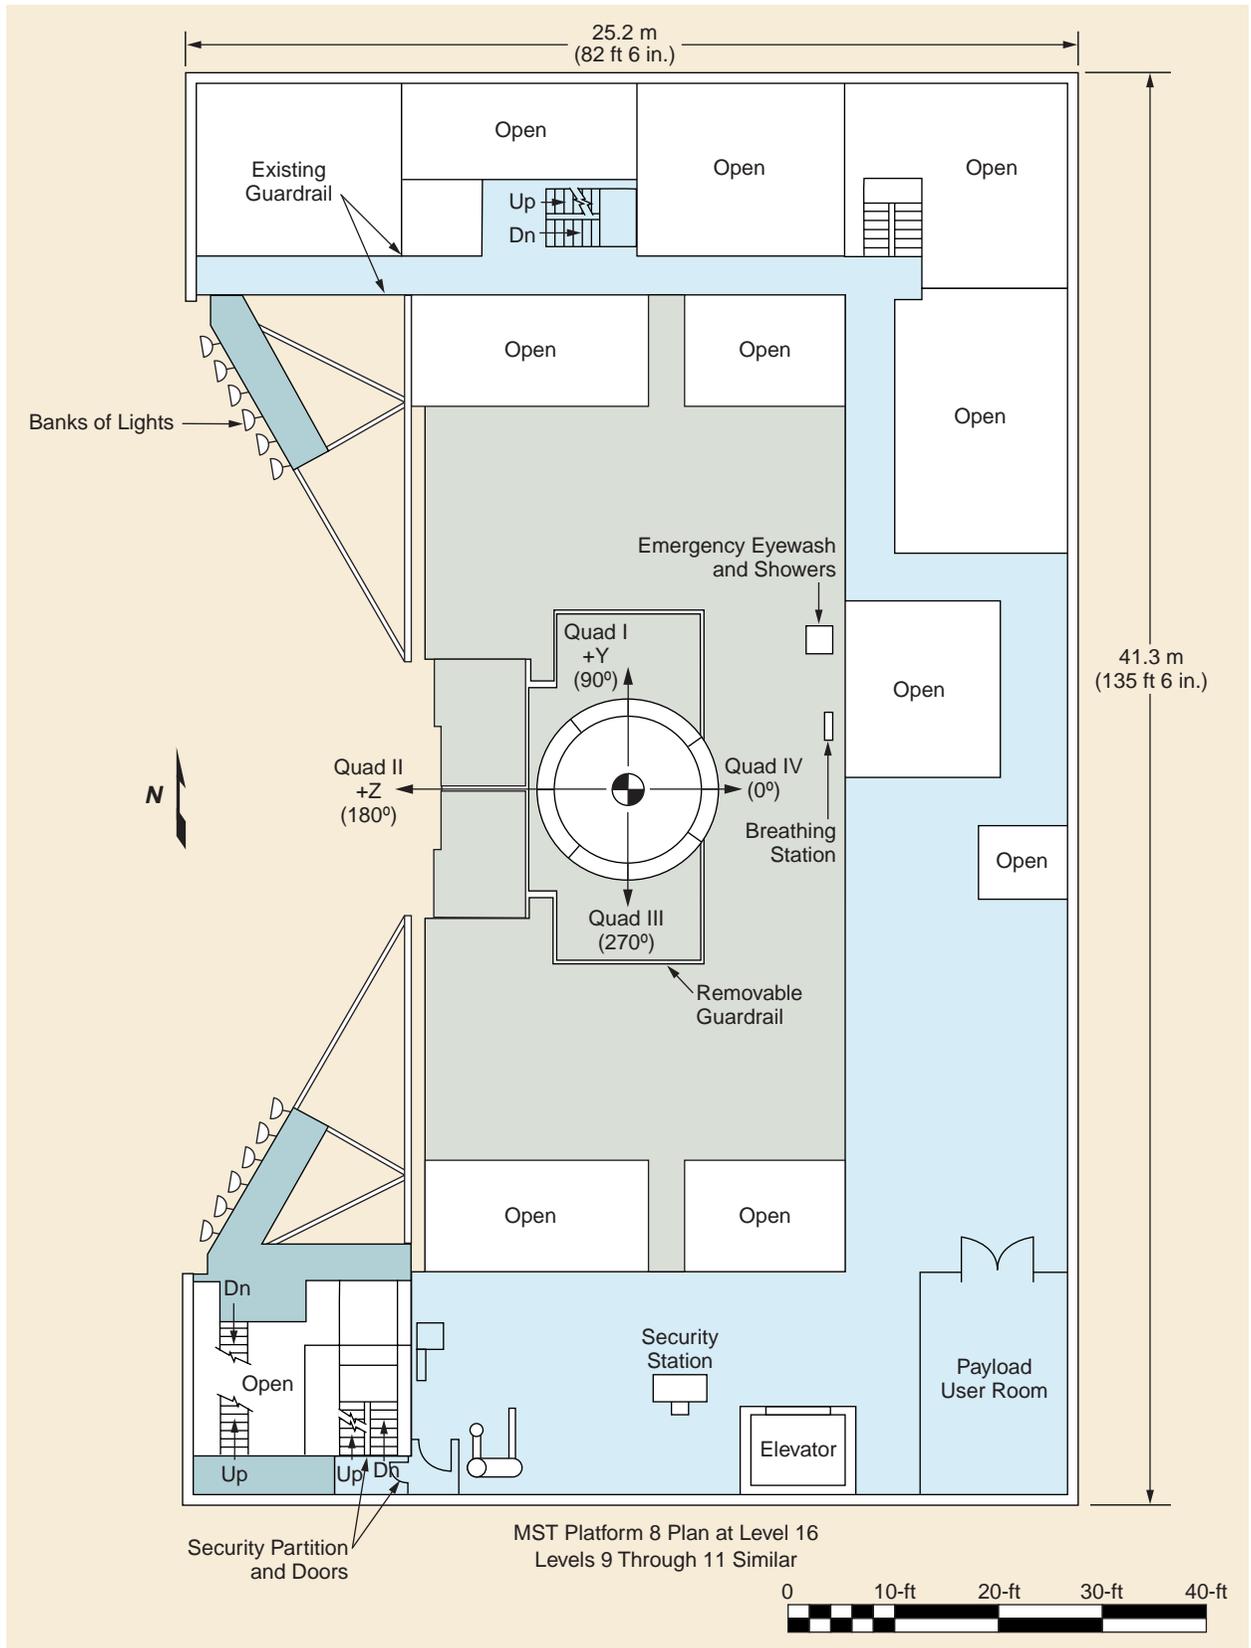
Platform 8 of Space Launch Complex 6 Mobile Service Tower Plan View
